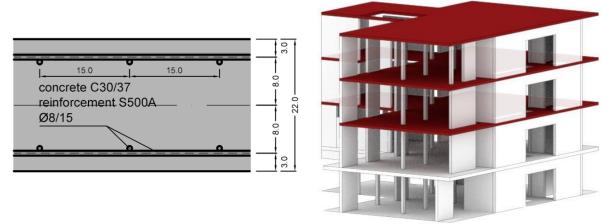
Slabs 22cm, section with reinforcement and location of these slabs in the building
